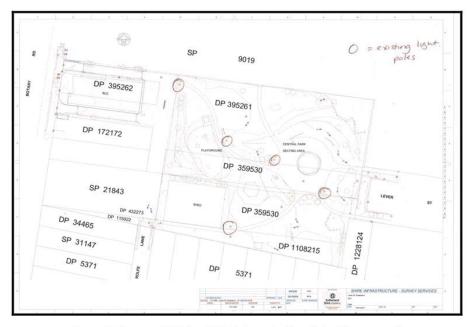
Survey of Existing Light Poles to be demolished (Structure C)
